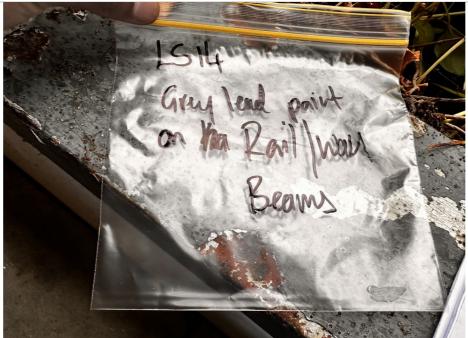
JVB – Sample 14 (S14): Sample of lead grey paint
